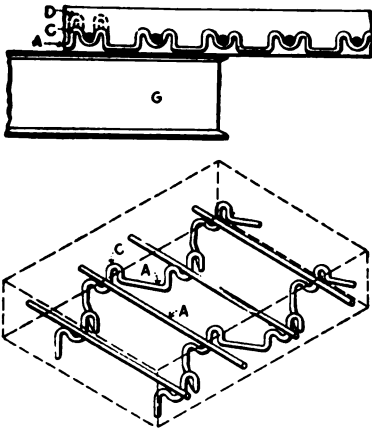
Scofield Spacing and Reinforcing Bar.
